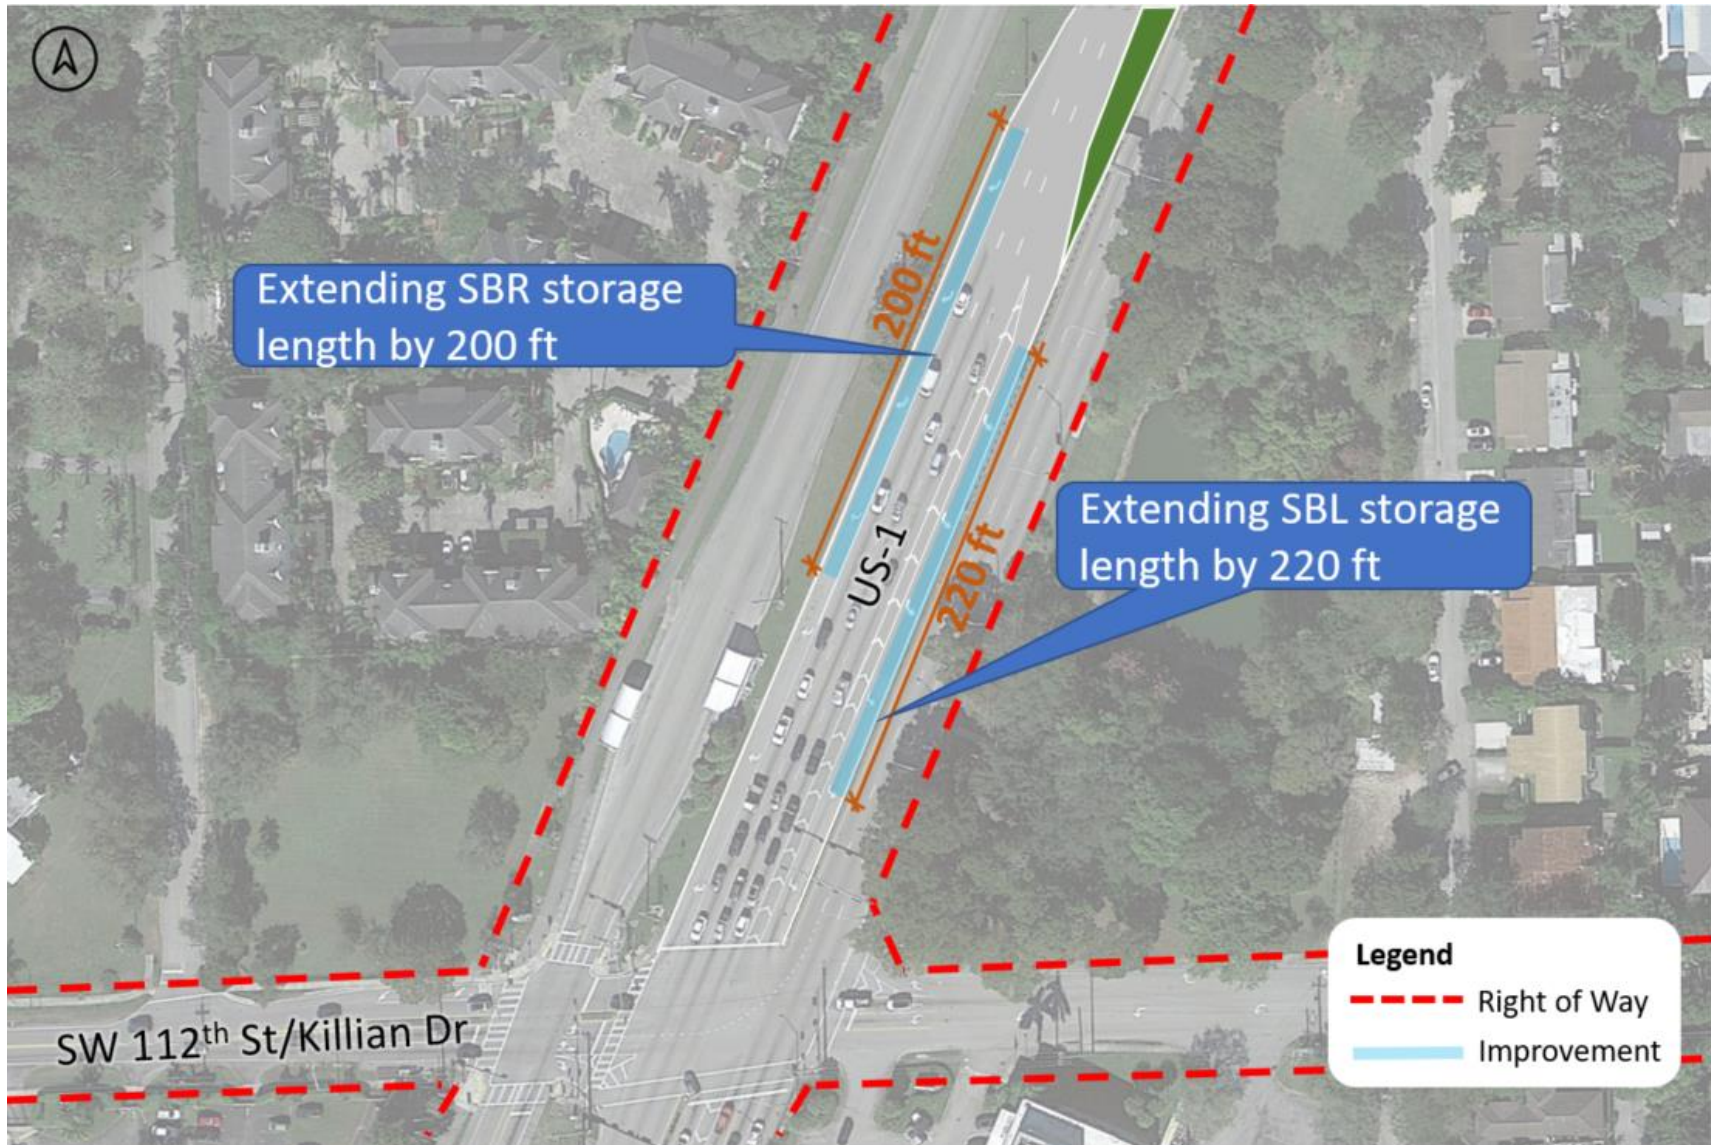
Conceptual Design Plan – US-1 and SW 112th Street/Killian Drive
